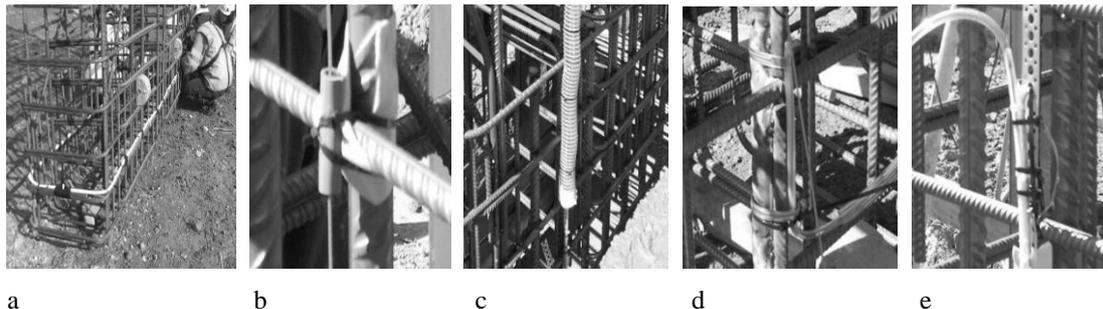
Pictures of the installation details of OV1: a) loop; b) guiding tube; c) protection at the top; d) fixed anchor point at the bottom; e) fixed anchor at the top (hook)
